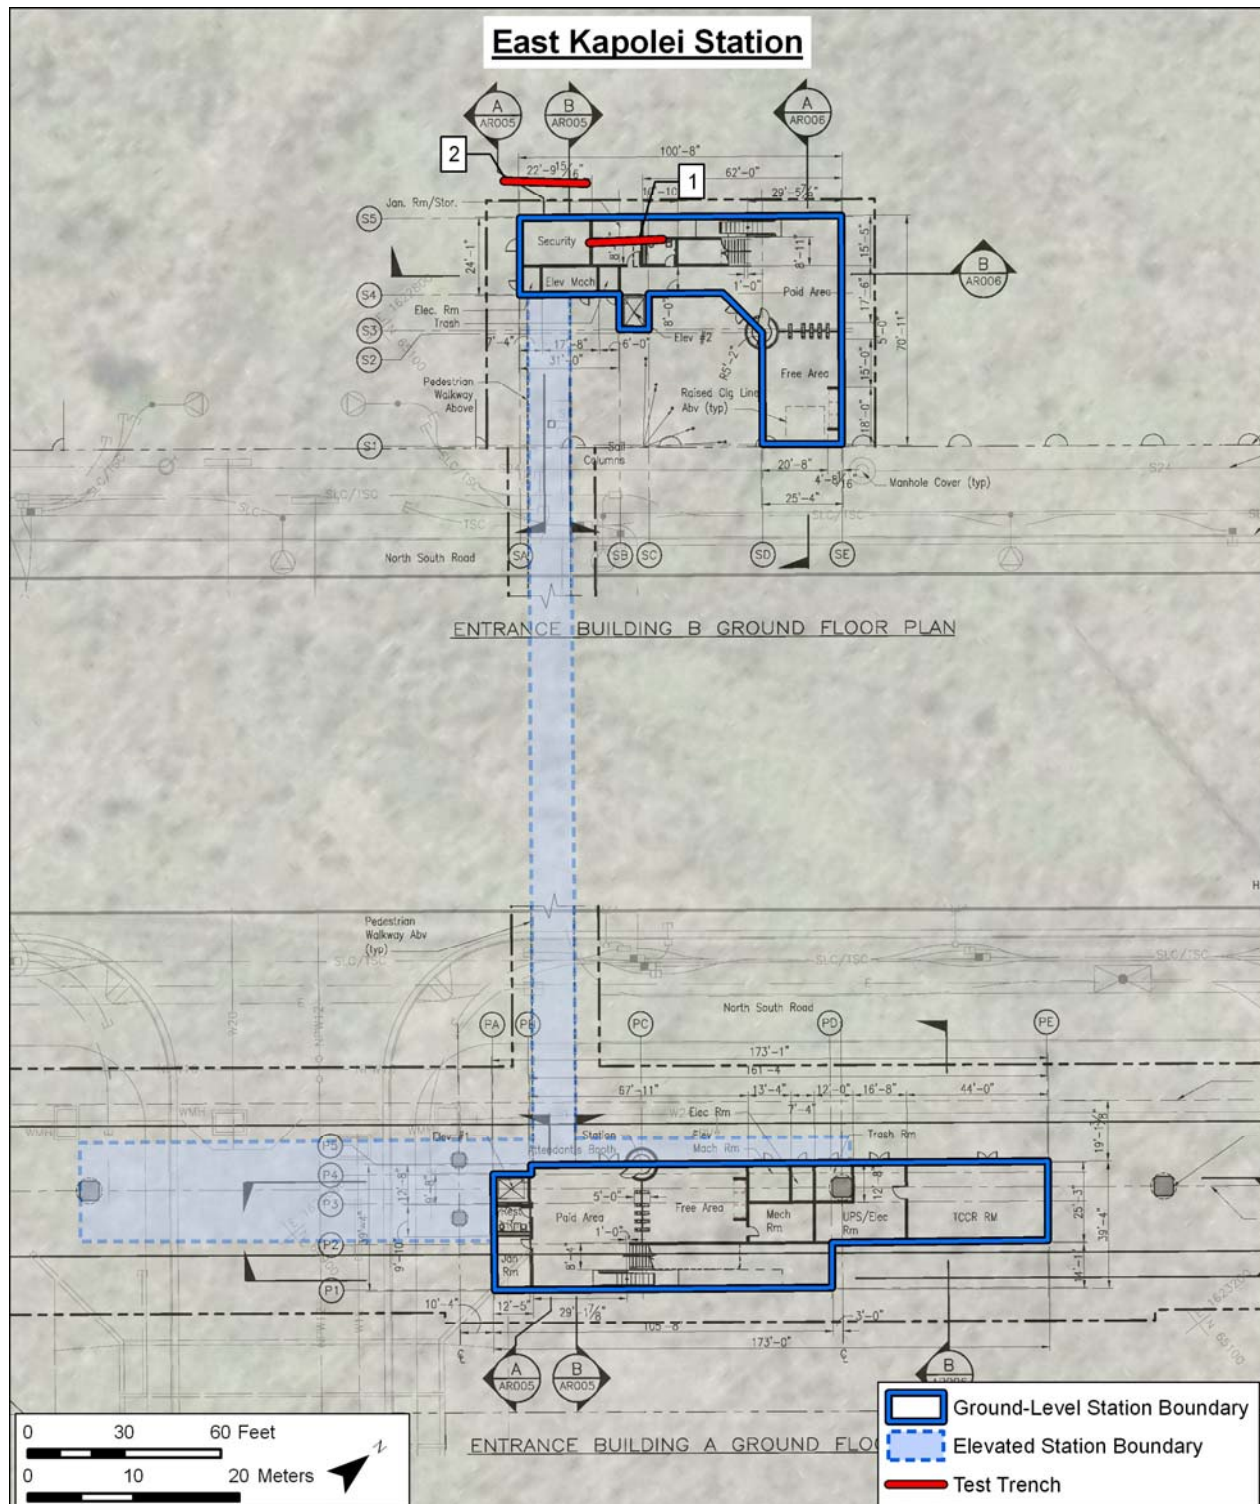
Floor Plan of East Kapolei Station showing location of test trenches
